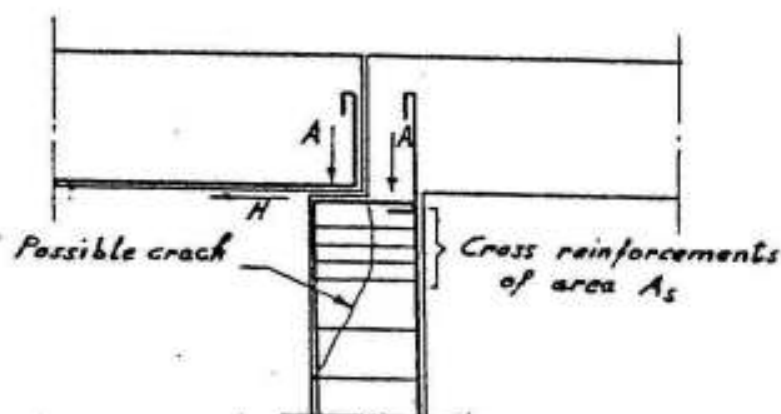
Horizontal forces and cross reinforcements at the head of a supporting column
